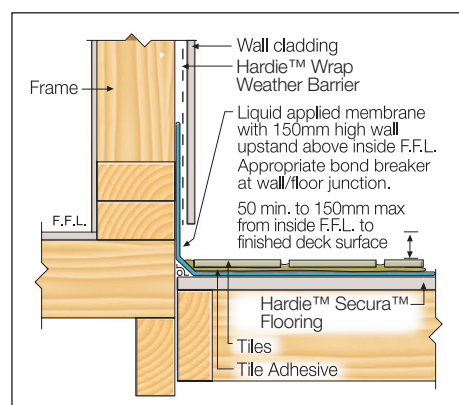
METHOD 1: WALL TO DECK FLASHING
